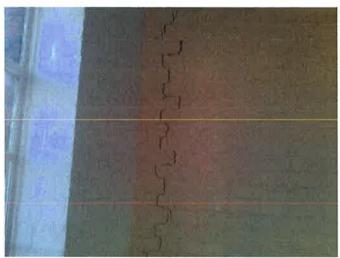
Cracking in transverse wall southeast corner, 15th September 2010
